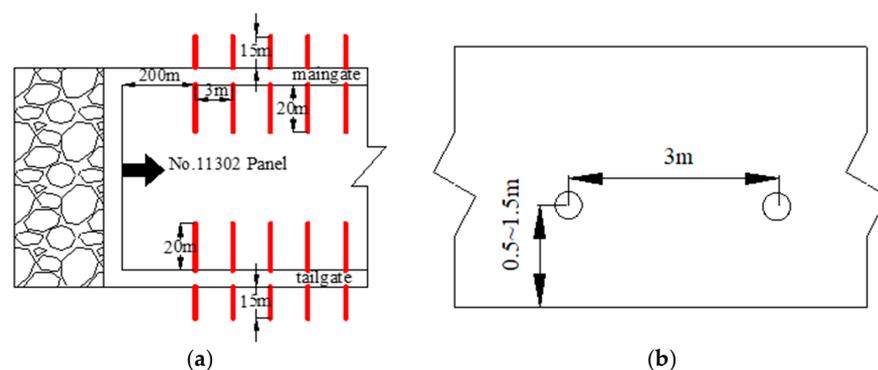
Plan and section of the pressure relief borehole in panel mining stage of No.11302 Panel. (a) Plan. (b) Section.
